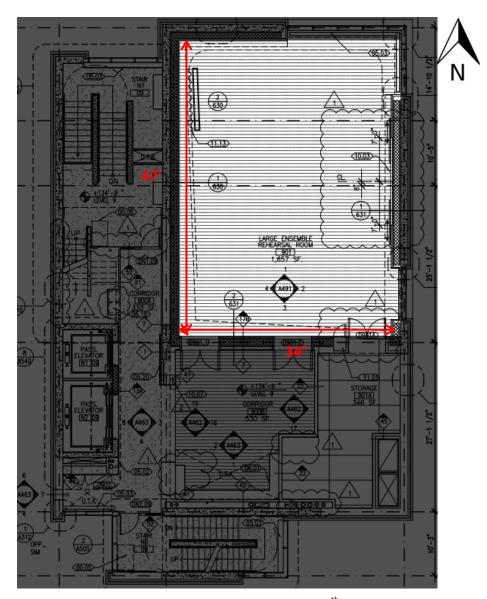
Performance Penthouse Floor Plan – 7^{th} Floor of Tower
